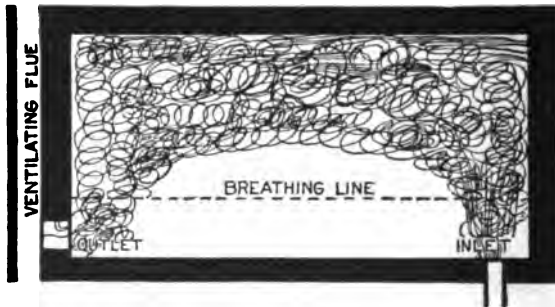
Air Admitted at Bottom, Discharged near Bottom.
